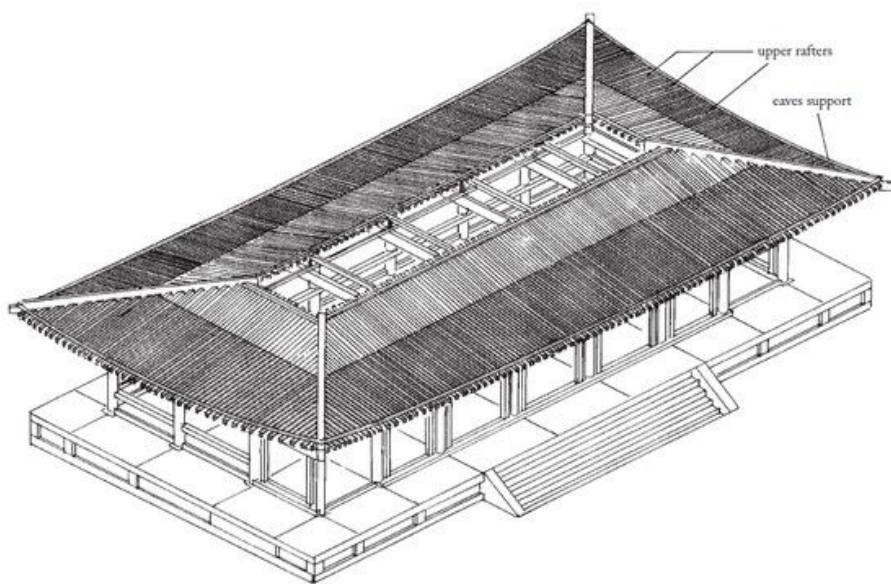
The Picture Hall after installation of the upper rafters and eaves supports.
